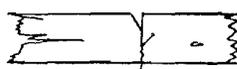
Showing batter strip with notch for holding line in place and nail to fasten it to.
